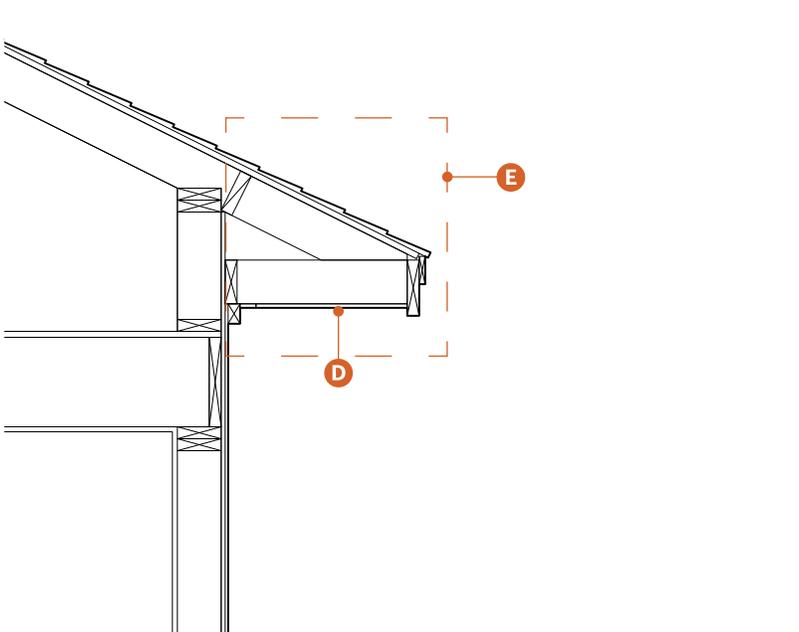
Section Detail of Highest Eave for Pitched Roof
